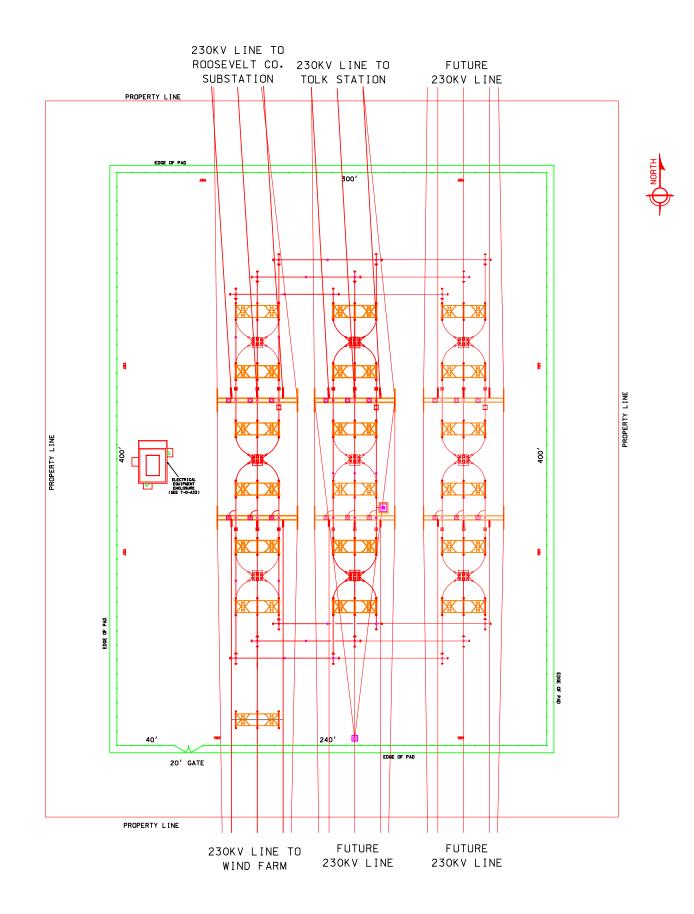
Site Layout 230 kV Sand Hills Switching Station.
